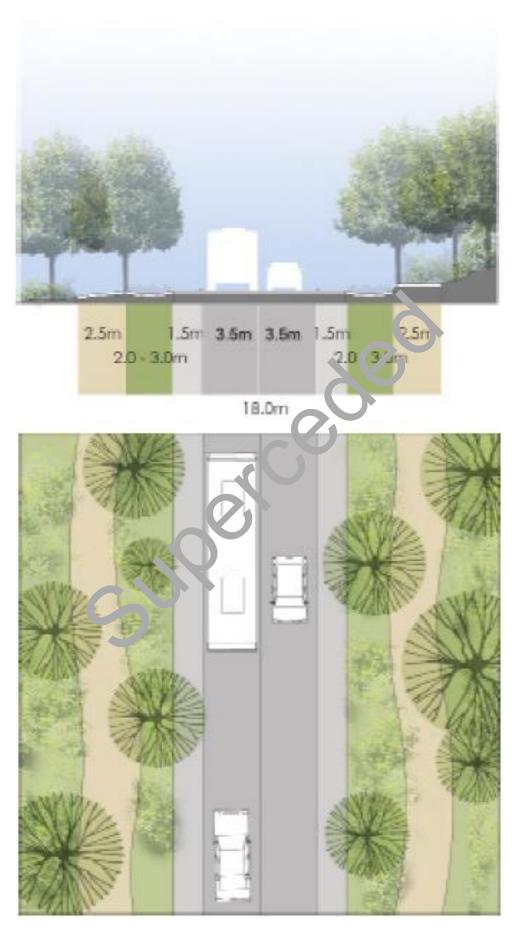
Western Link Road (Preserve) cross section and indicative plan
